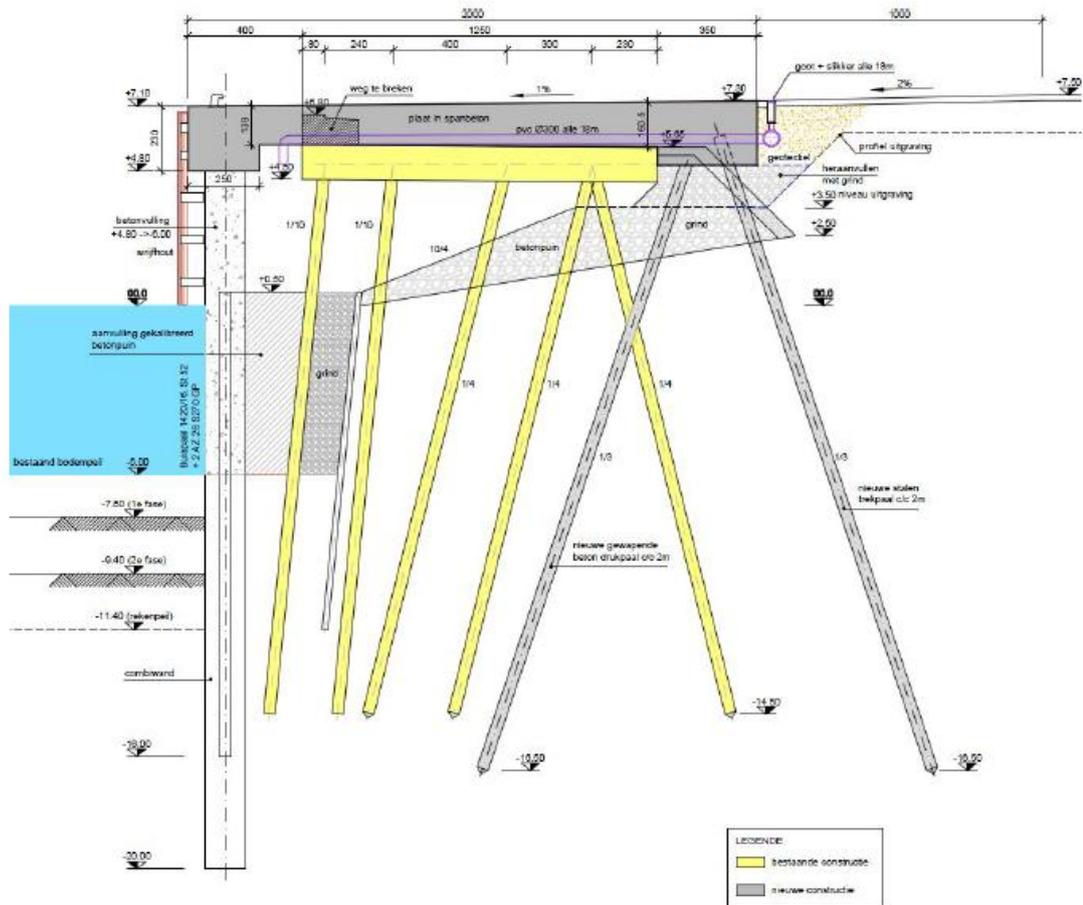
Port of Ostend – REBO site – reinforced quay wall (source: Technum)
